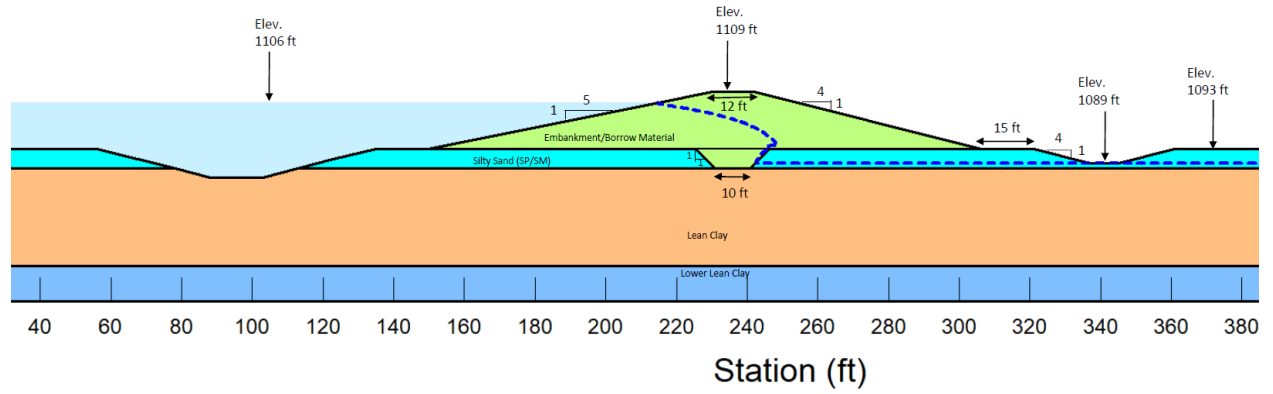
Cross Section at BH-8 with Exterior Drainage Ditch
